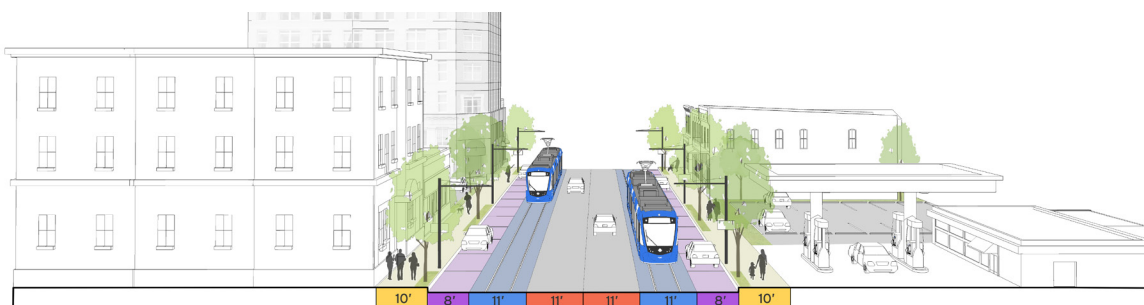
MIXED TRAFFIC STREETCAR WITH ON-STREET PARKING IN TWO LANES SOUTH OF LINWOOD TO BRUSH CREEK
